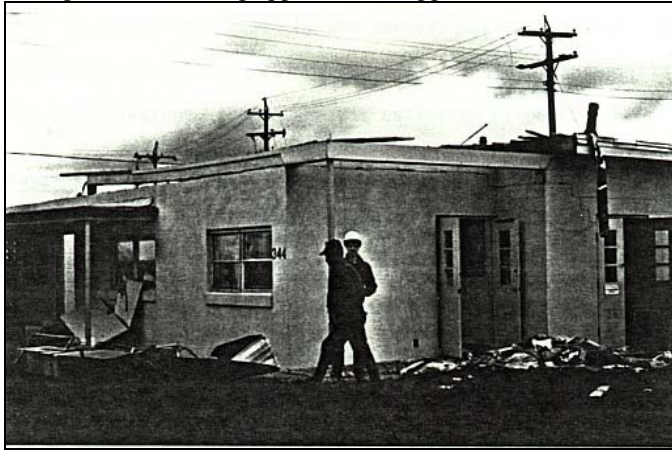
Southeast elevation view of the Veterinary Clinic. The cracks in the mortar joint below the bond beam occurred as the roof was uplifted.
